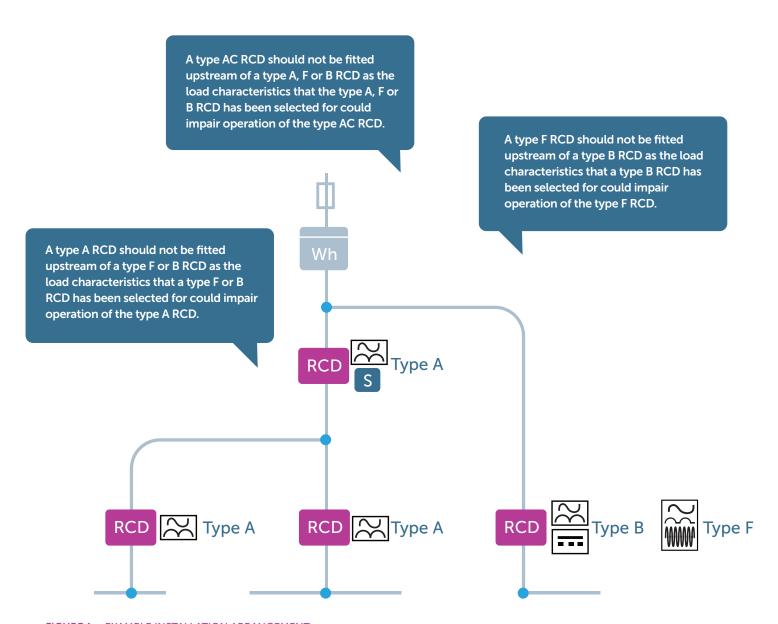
EXAMPLE INSTALLATION ARRANGEMENT
